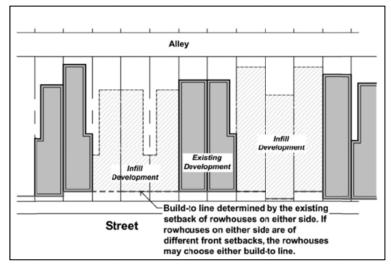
Setback for roughhouse infill of three or more dwelling units
